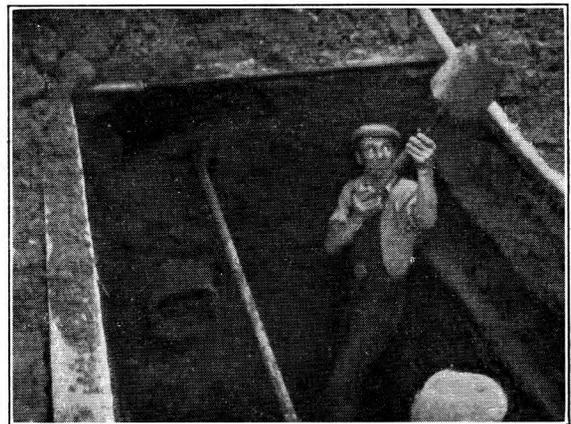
MANHOLE EXCAVATION IN WET SITUATION.
